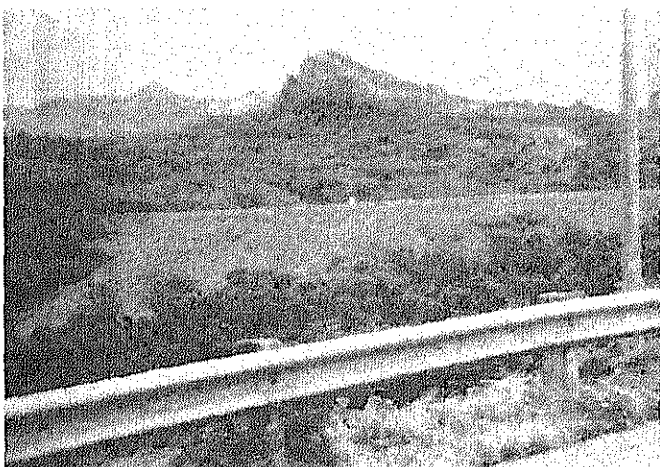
Conditions of the downstream slope-face of the Pantabangan Dam
